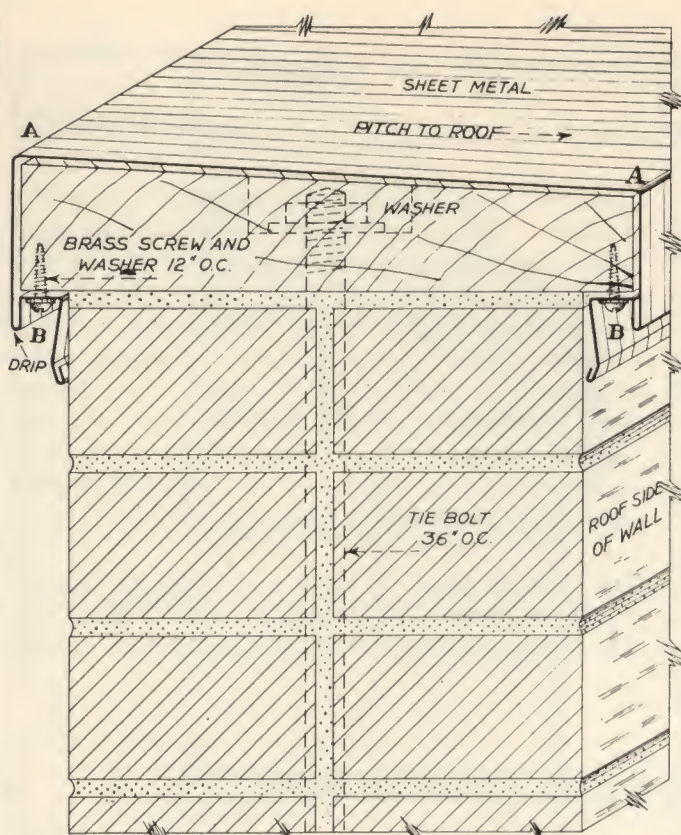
SHEET METAL COPING — SECURED WITH BRASS SCREWS
